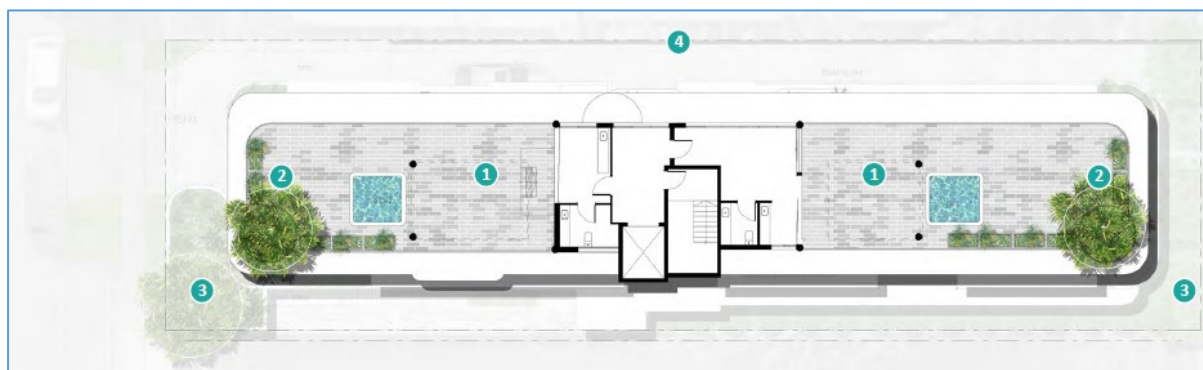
Proposed Landscape Concept Plan - Roof Level (Shepherd)
